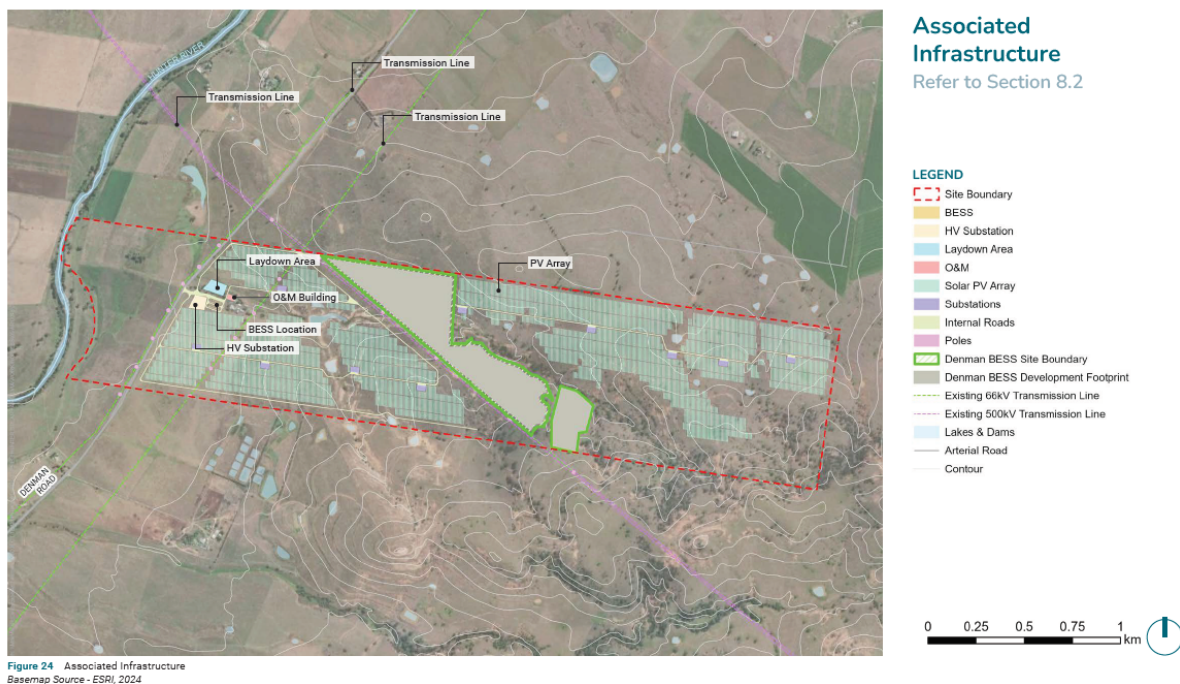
Project Layout (source, EIS Appendix K figure 24)
